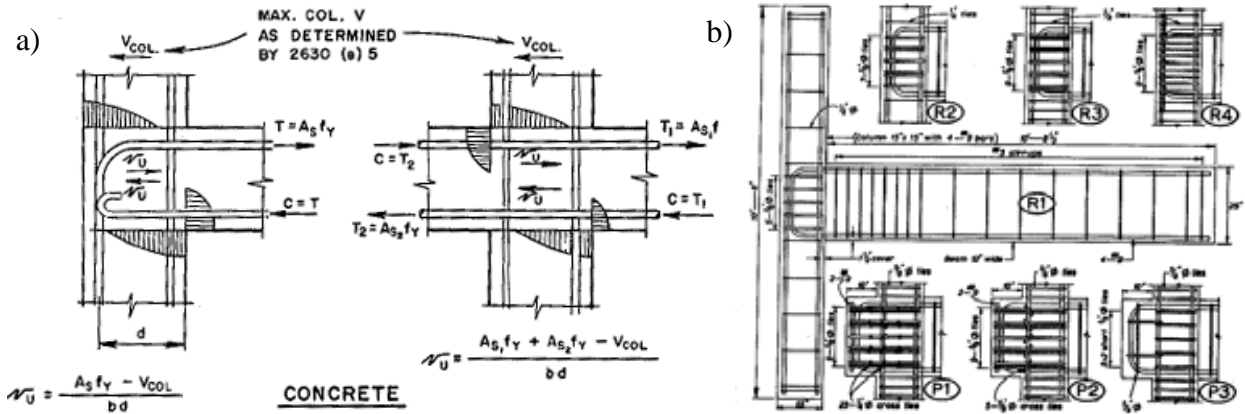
Design and detailing of exterior beam-column joints: a) Joint shear model presented in 1973 SEAOC recommendations [215]; b) Various configurations of joint detailing tested in New Zealand[187].
